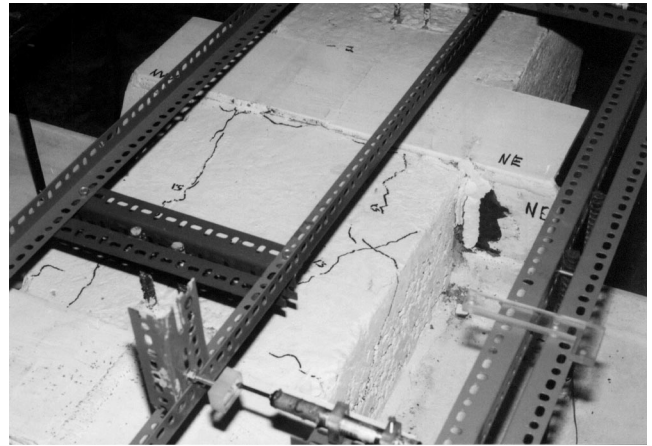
Crack pattern on concrete-encasement for Specimen 2.
